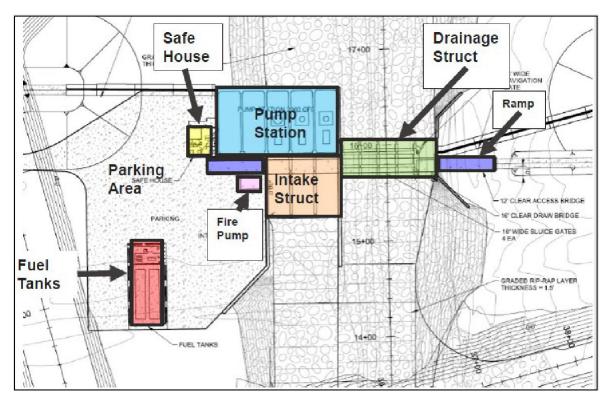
Typical Layout of a Pump Station with Large Pumping Capacity
